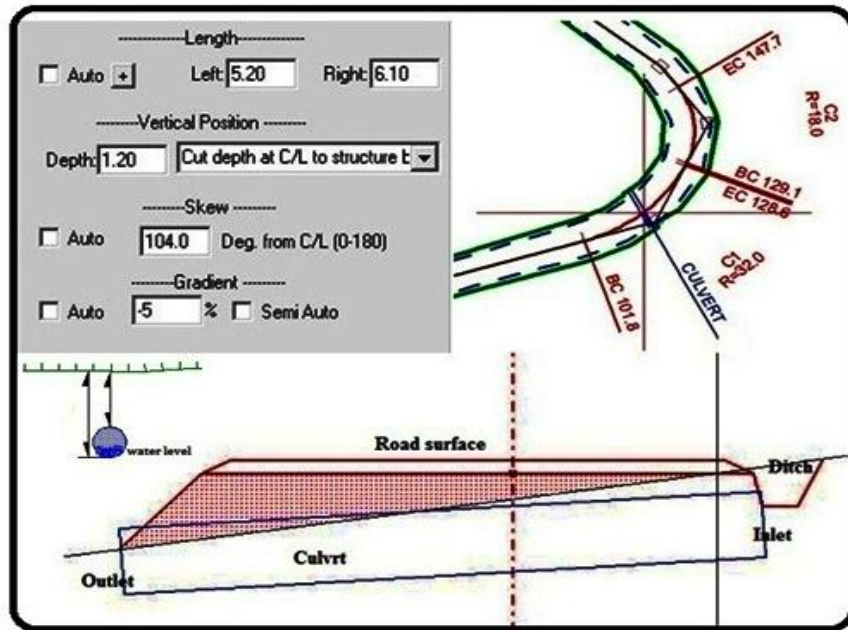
Locating and simulating culverts according to fish passage and geometric design of fores road in culvert installation point
